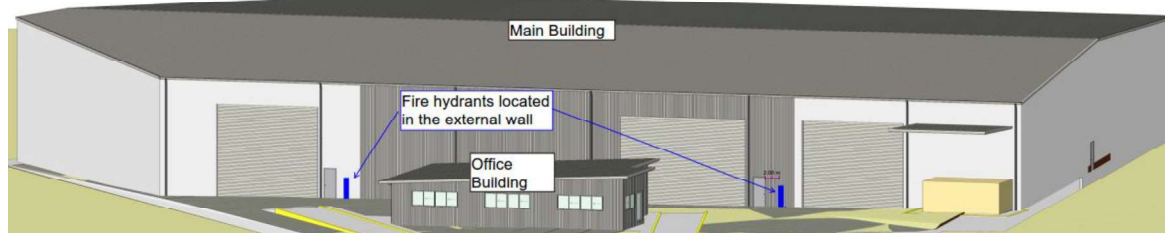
3D perspective of the building with the external hydrants marked up
